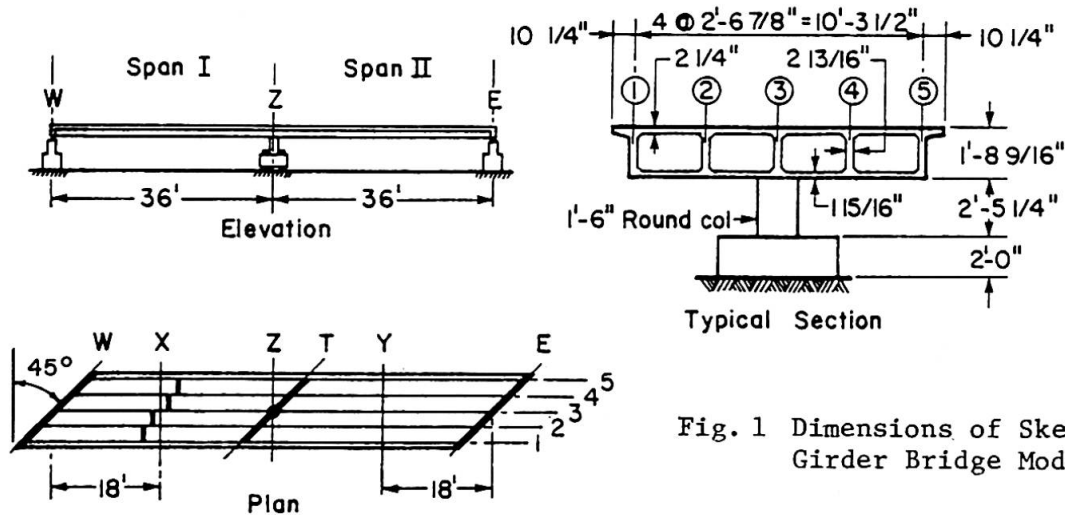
Dimensions of Skew Box Girder Bridge Model
